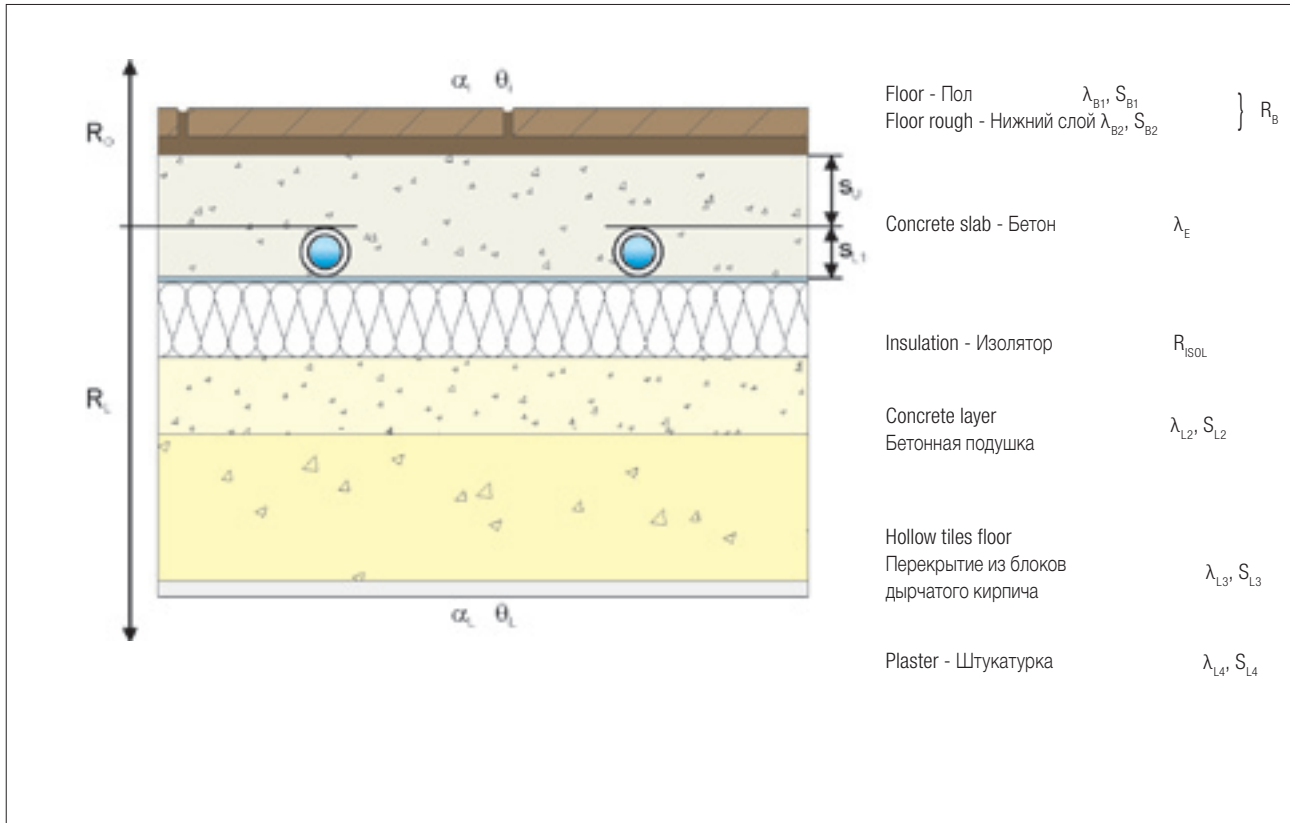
shows the flooring generally used for underfloor heating systems.
